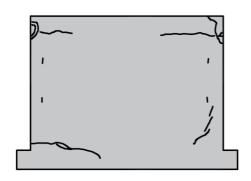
Final cracking pattern of the specimen retrofitted with developed TRM.
